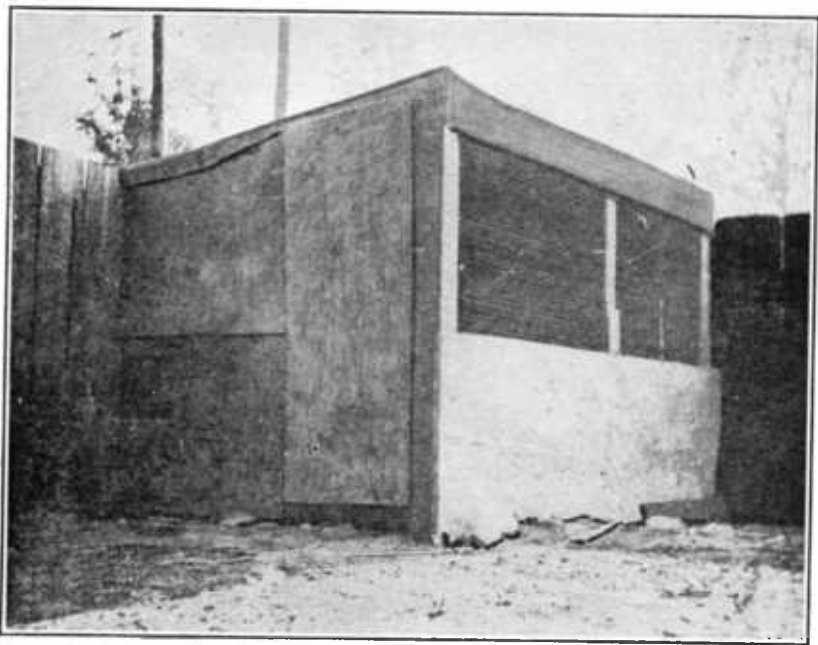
Poultry house built in the corner of a board fence, utilizing the fence for the back and one side of the house.
